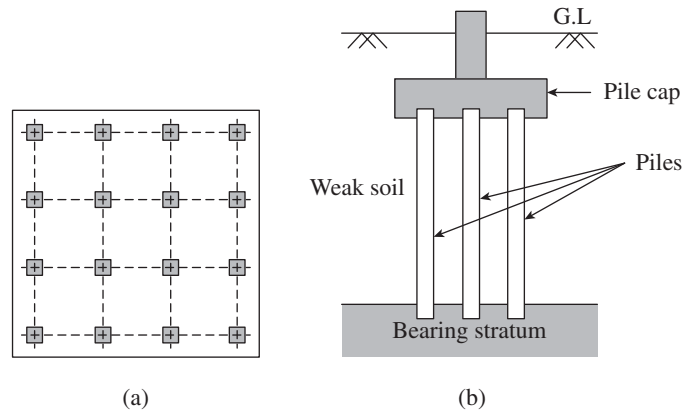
Mat and pile foundation (a) Mat foundation (b) Pile foundation
